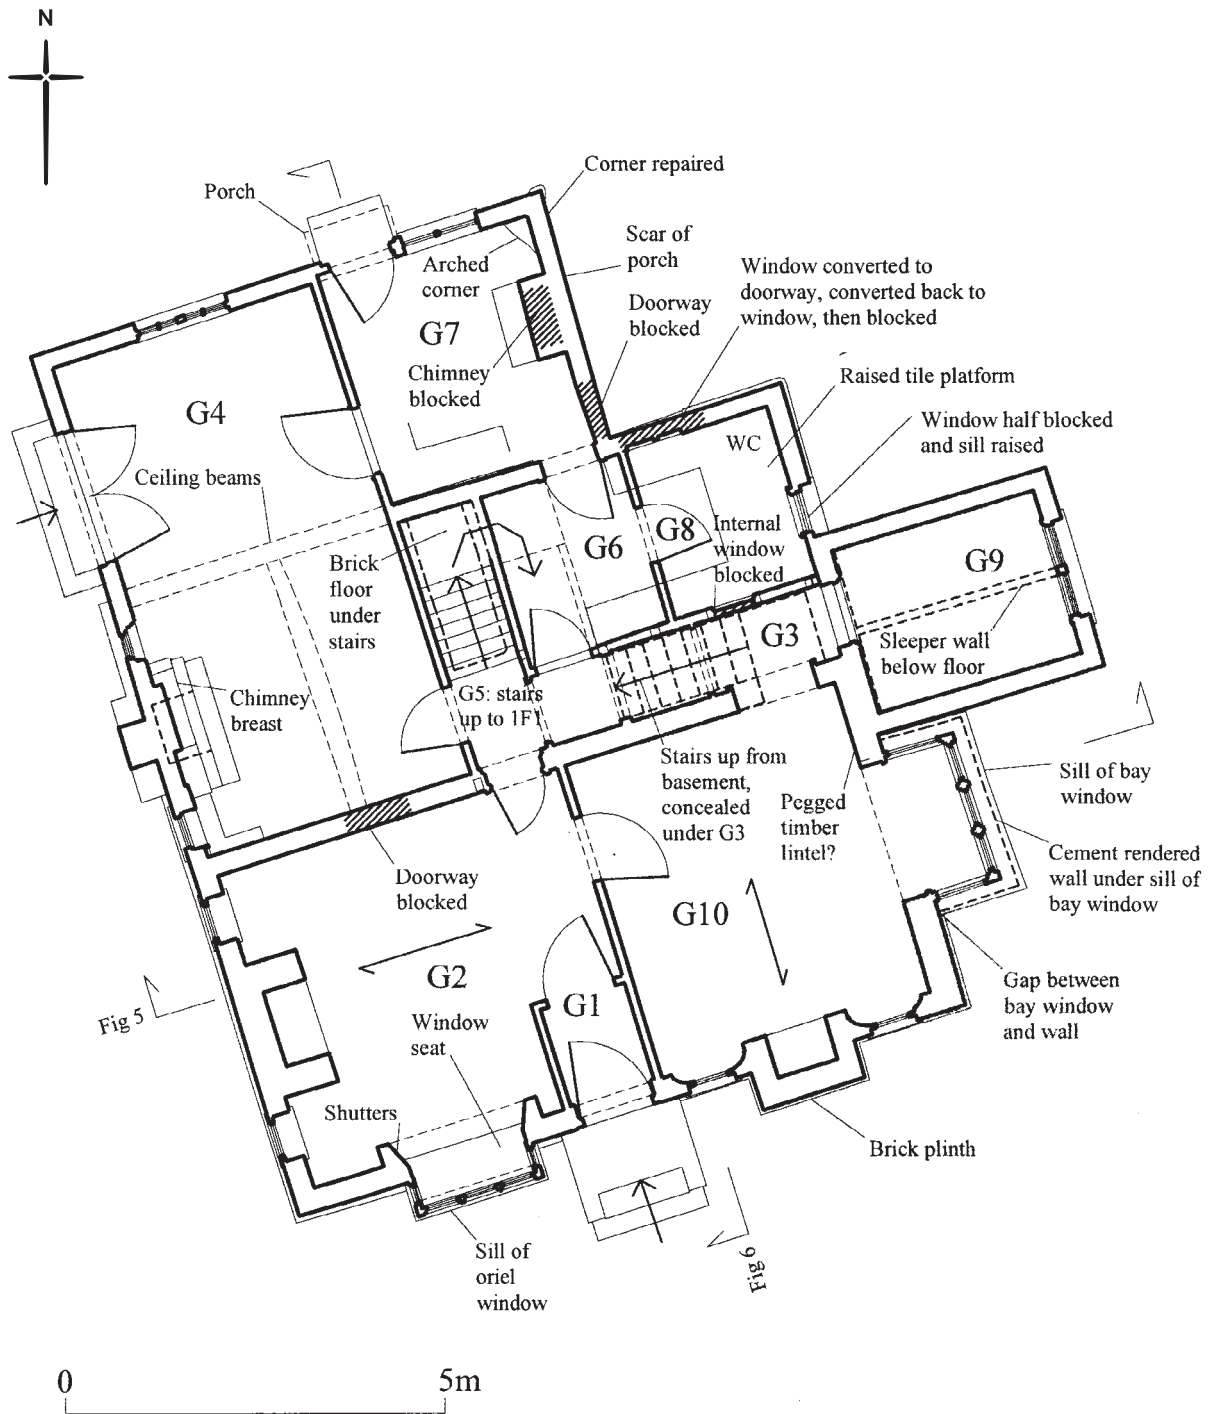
Plan of the farmhouse at ground-floor level (1:100)
